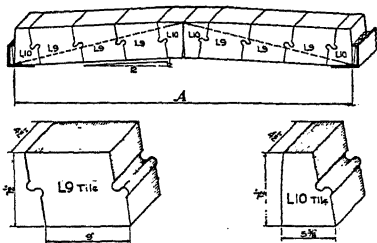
Flat arch for doors or narrow furnaces utilizing special interlocking shapes which are self-supported.
